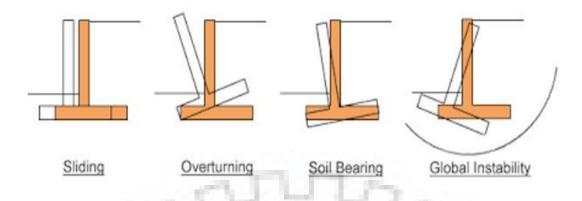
Failure mechanism of Retaining wall (www.wikipedia.com)
